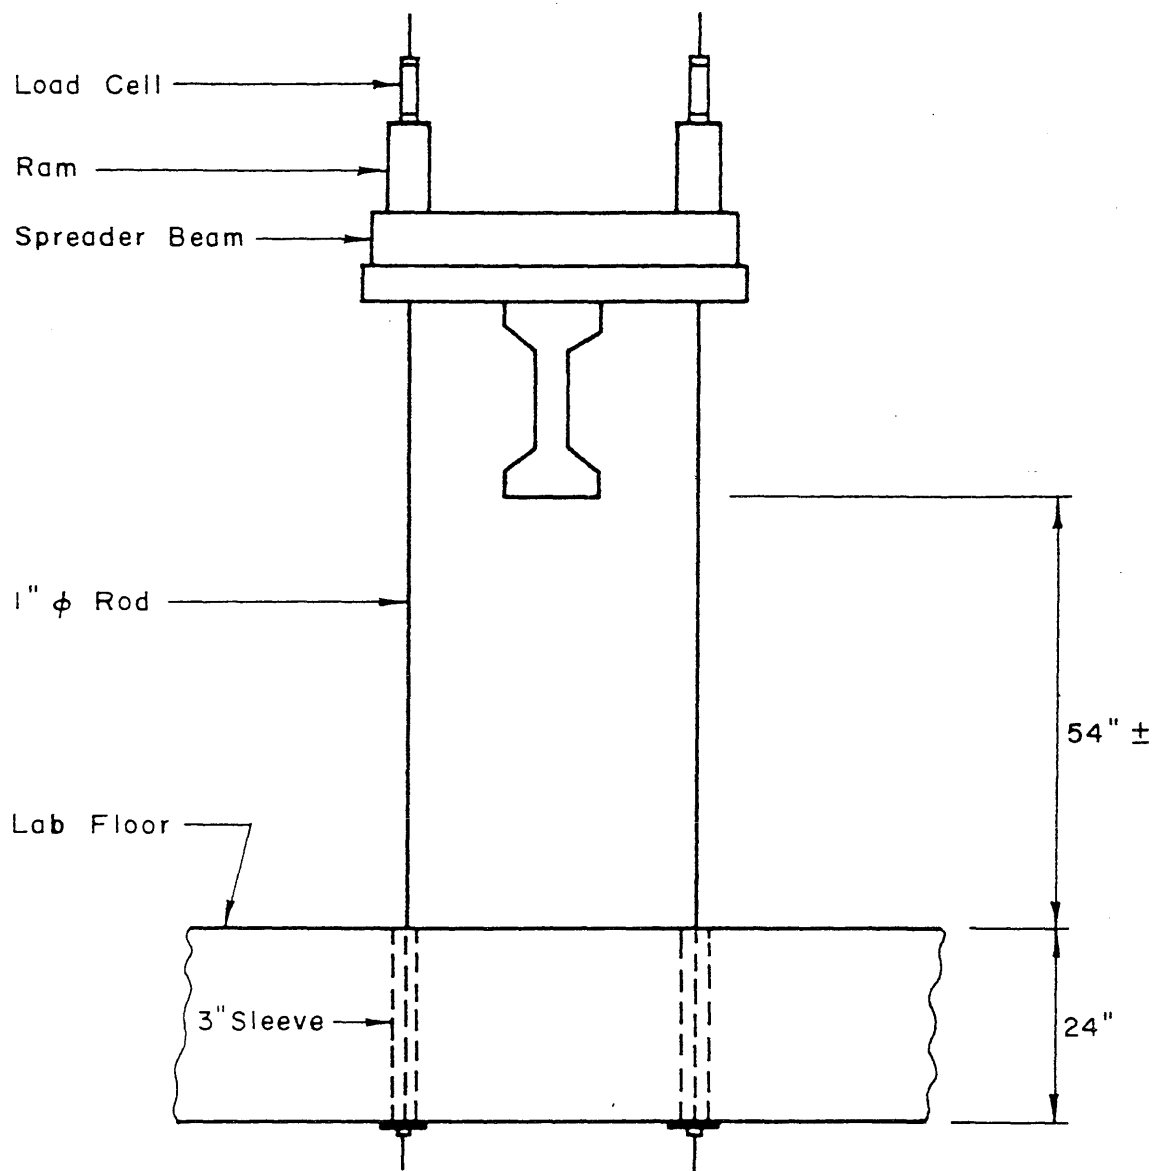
ARRANGEMENT OF LOADING BEAMS, HYDRAULIC RAMS, AND LOAD CELLS ON TOP OF STRUCTURES
